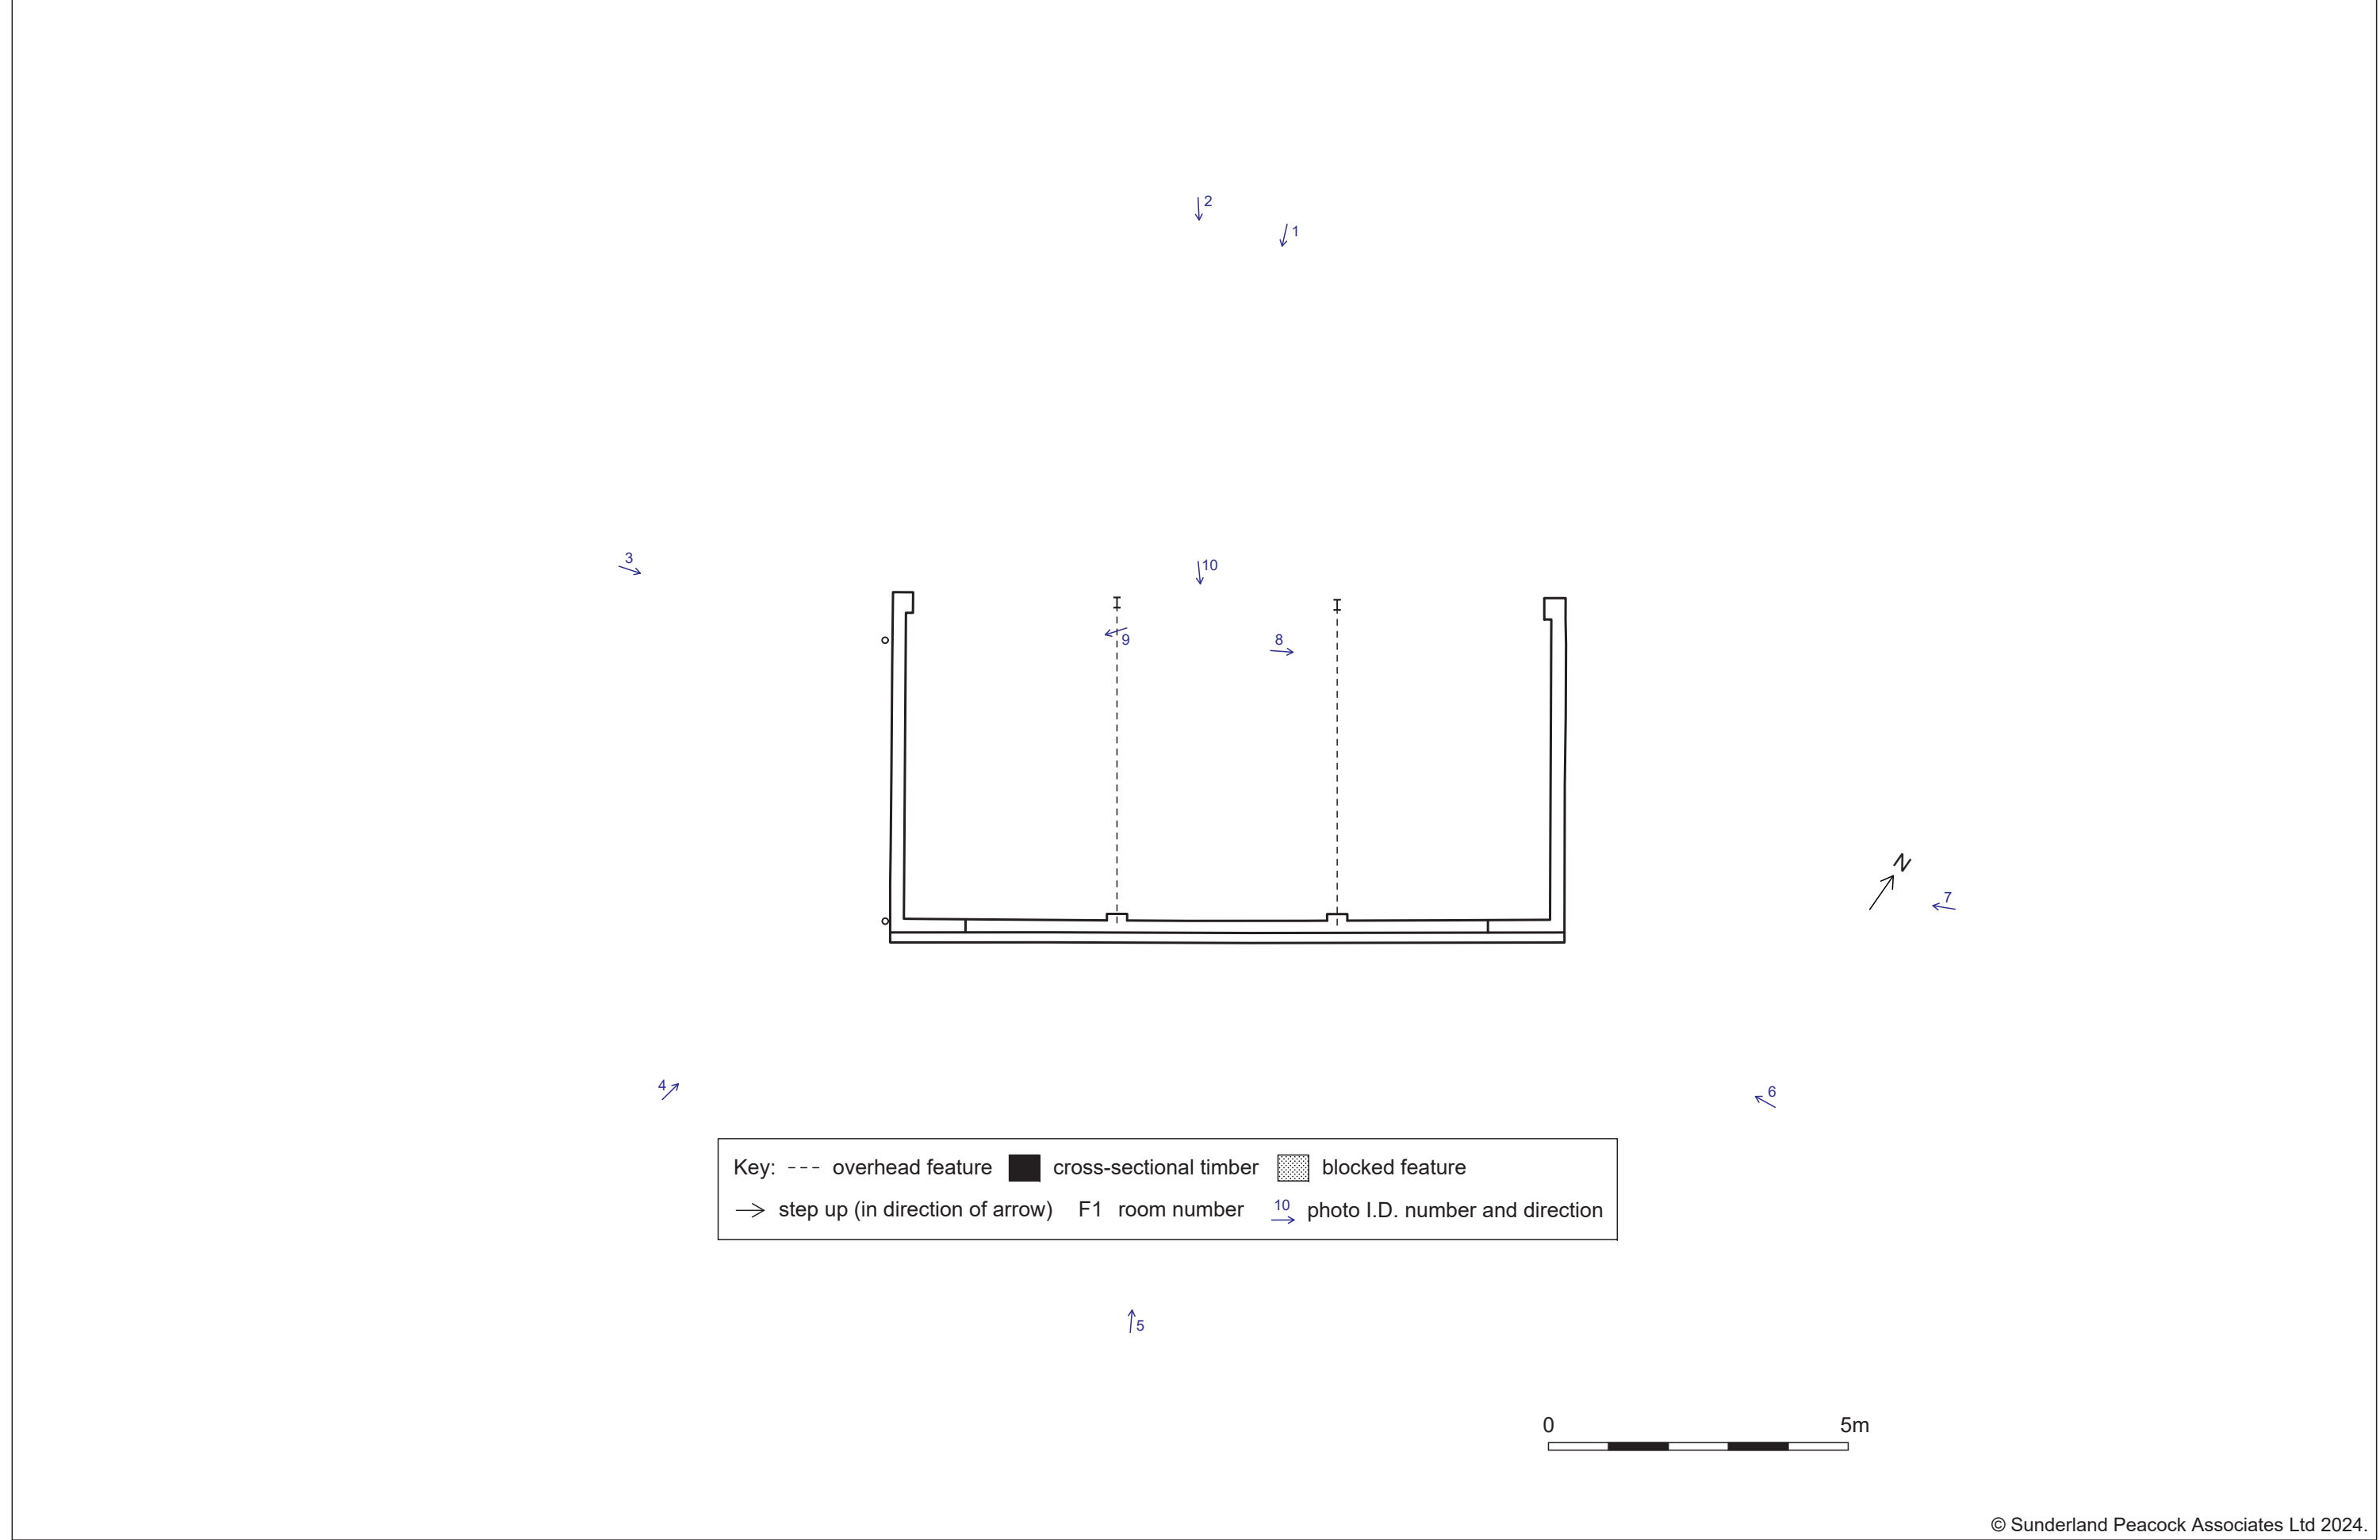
Ground floor plan of Outbuilding 2, showing the location and direction of photographs taken
